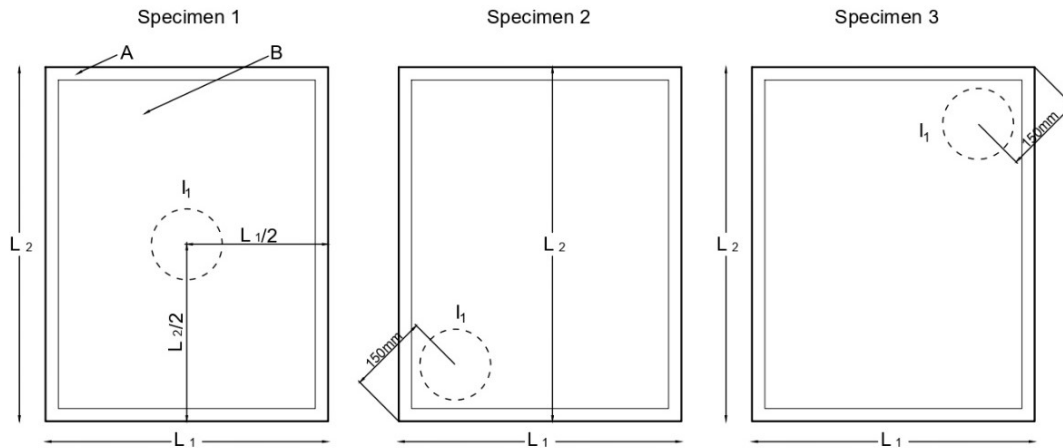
Impact area of wood lumber missile impact test for individual windows, doors, curtain walling or windstorm protective systems tested separately (following ASTM 2020).
